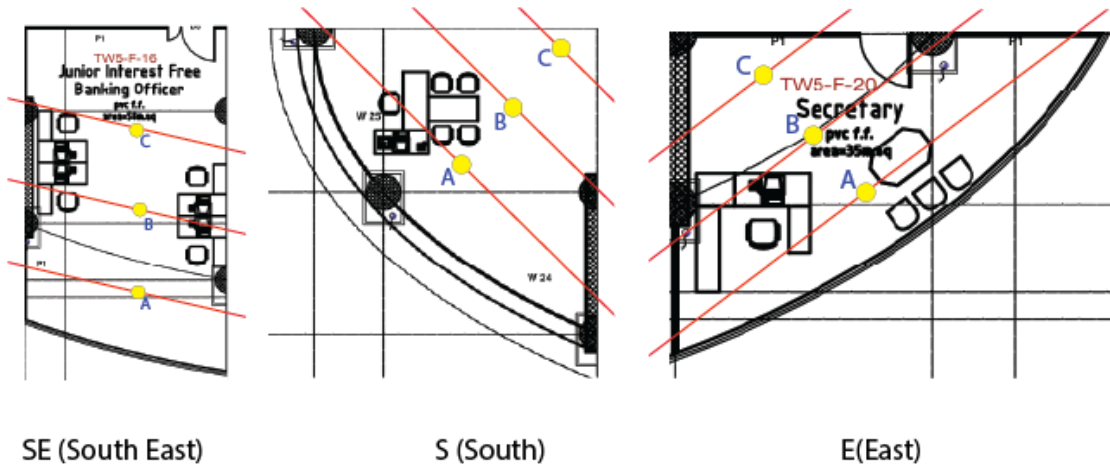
Floor Plan Showing Grid Points in South East, South, and East Orientations
